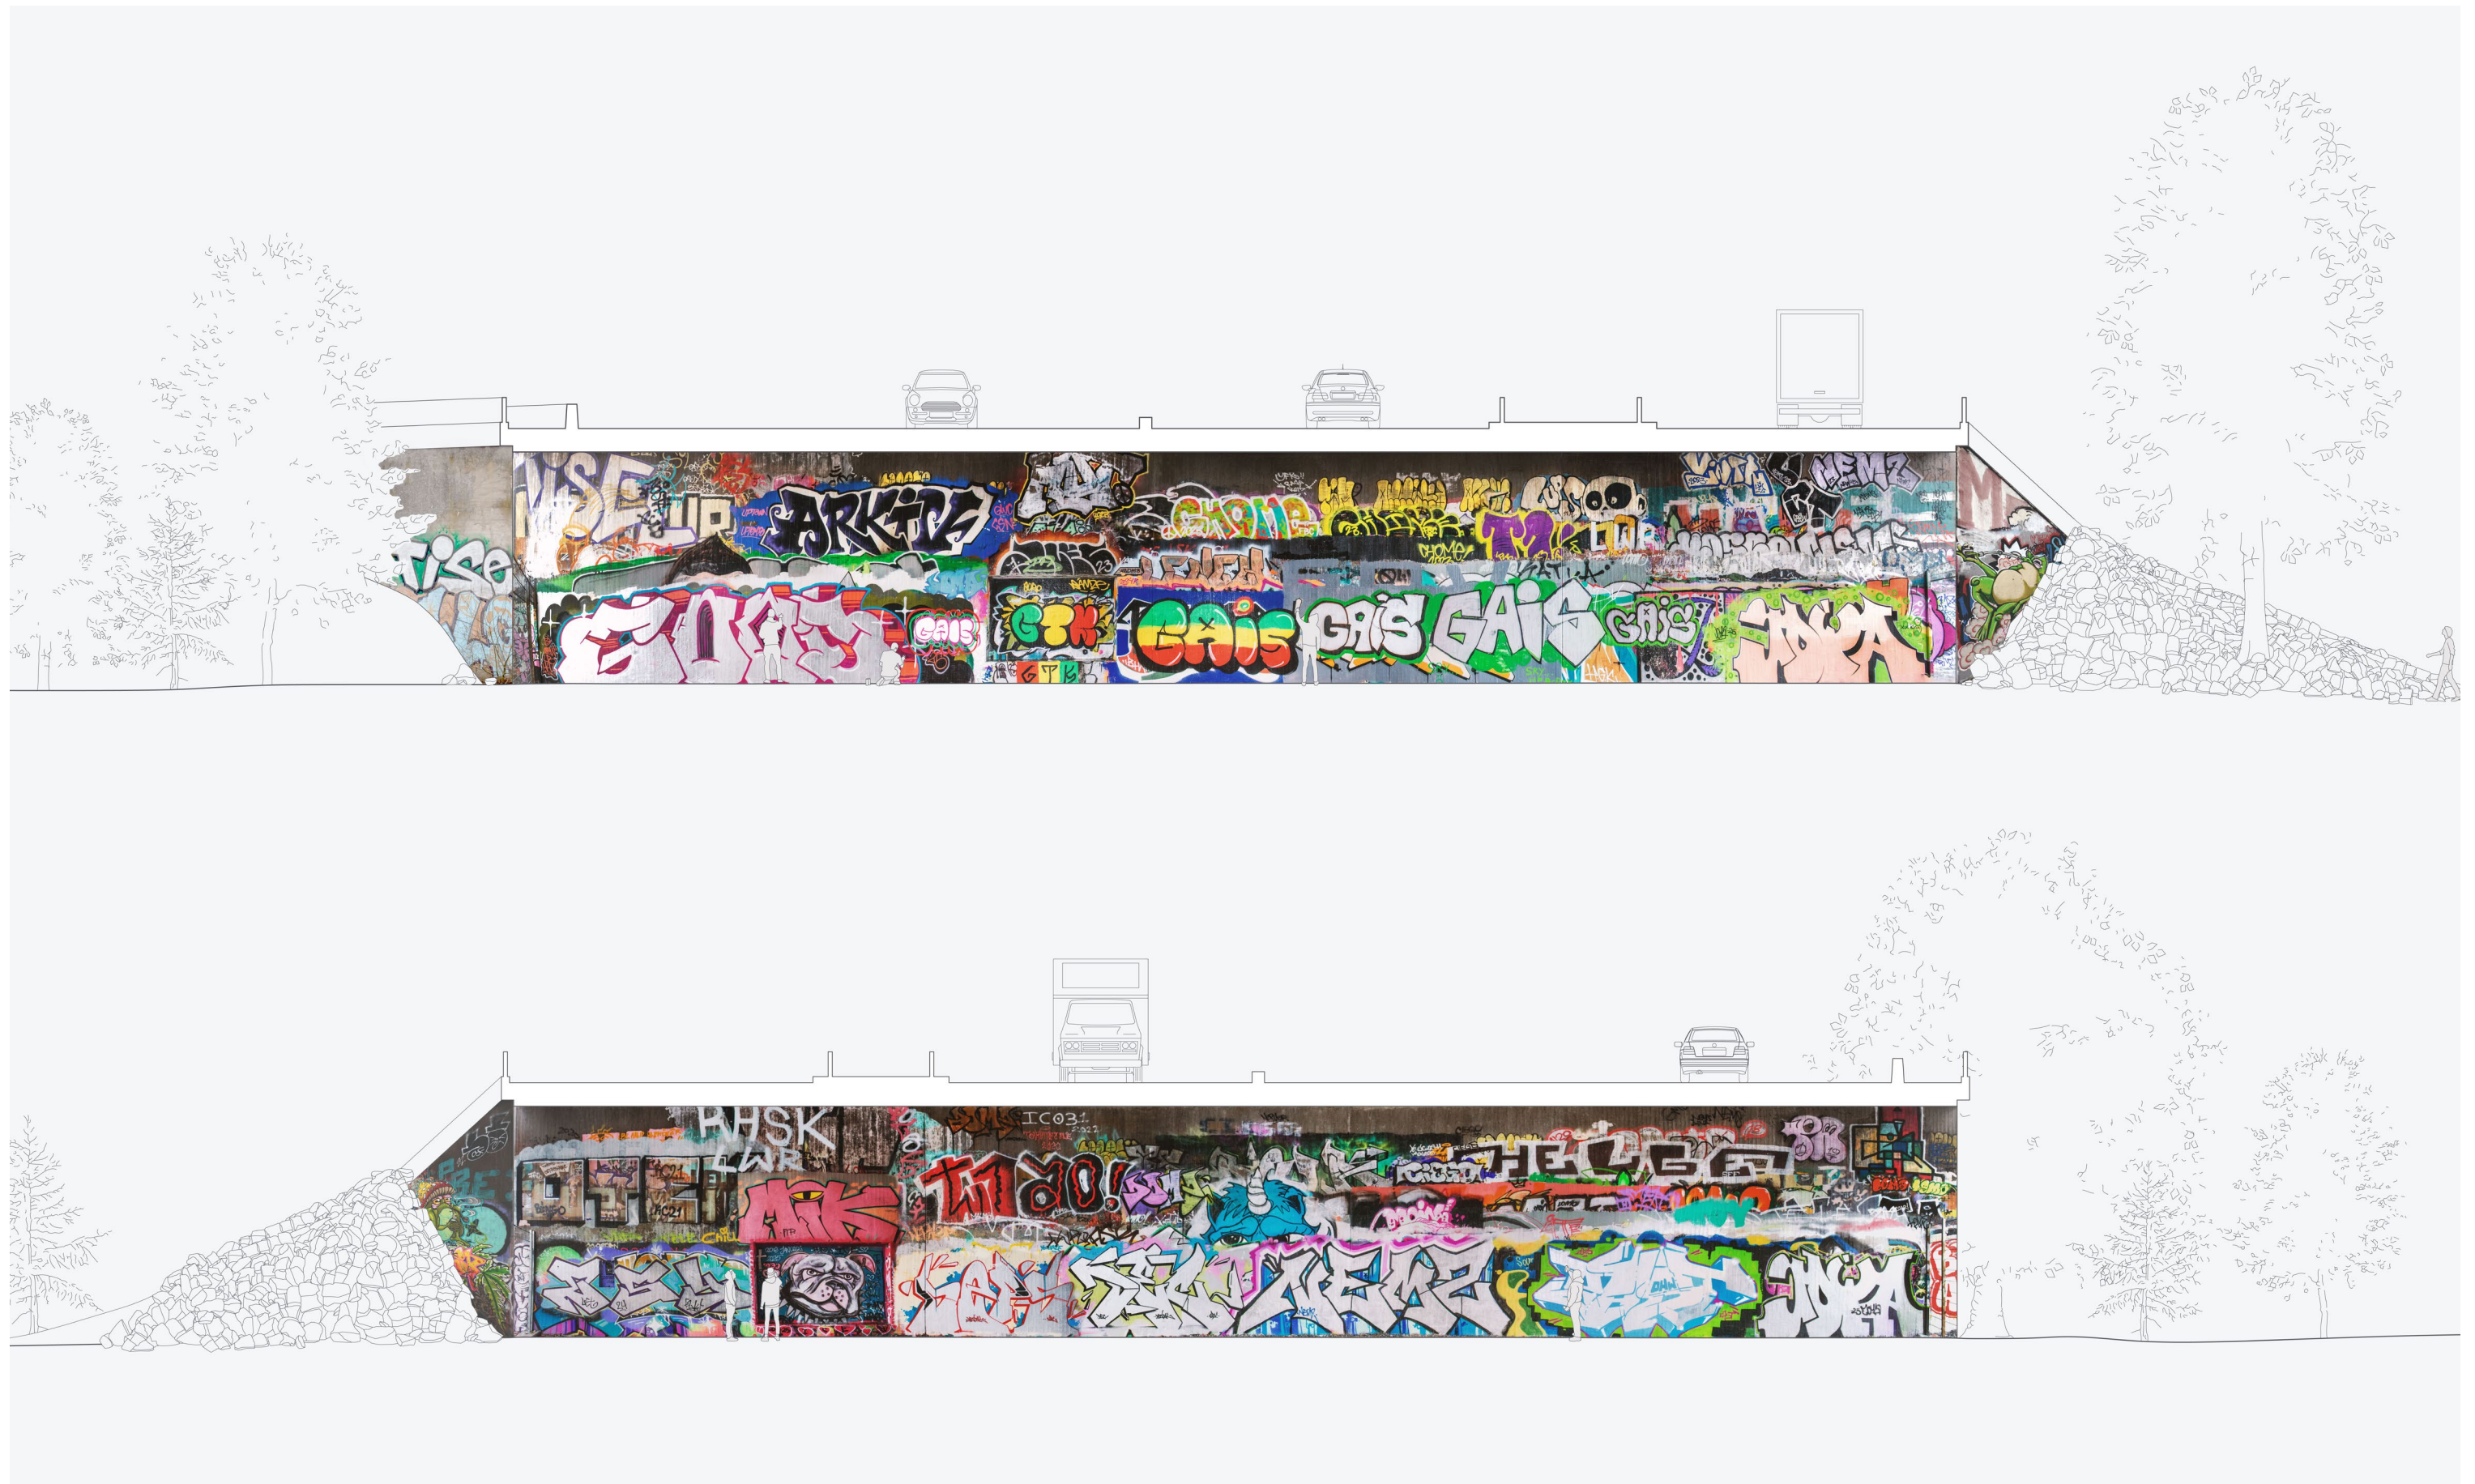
[57.726, 11.980] Sections through Ringögan tunnel, visualizing graffiti in architectural elevation.
